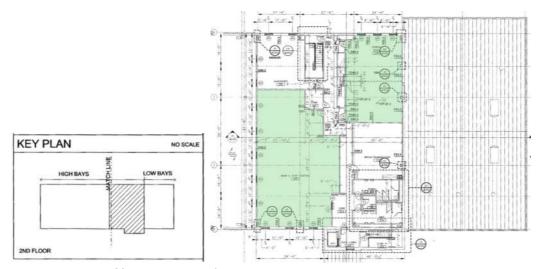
TEMF second floor plan showing regularly occupied spaces.
